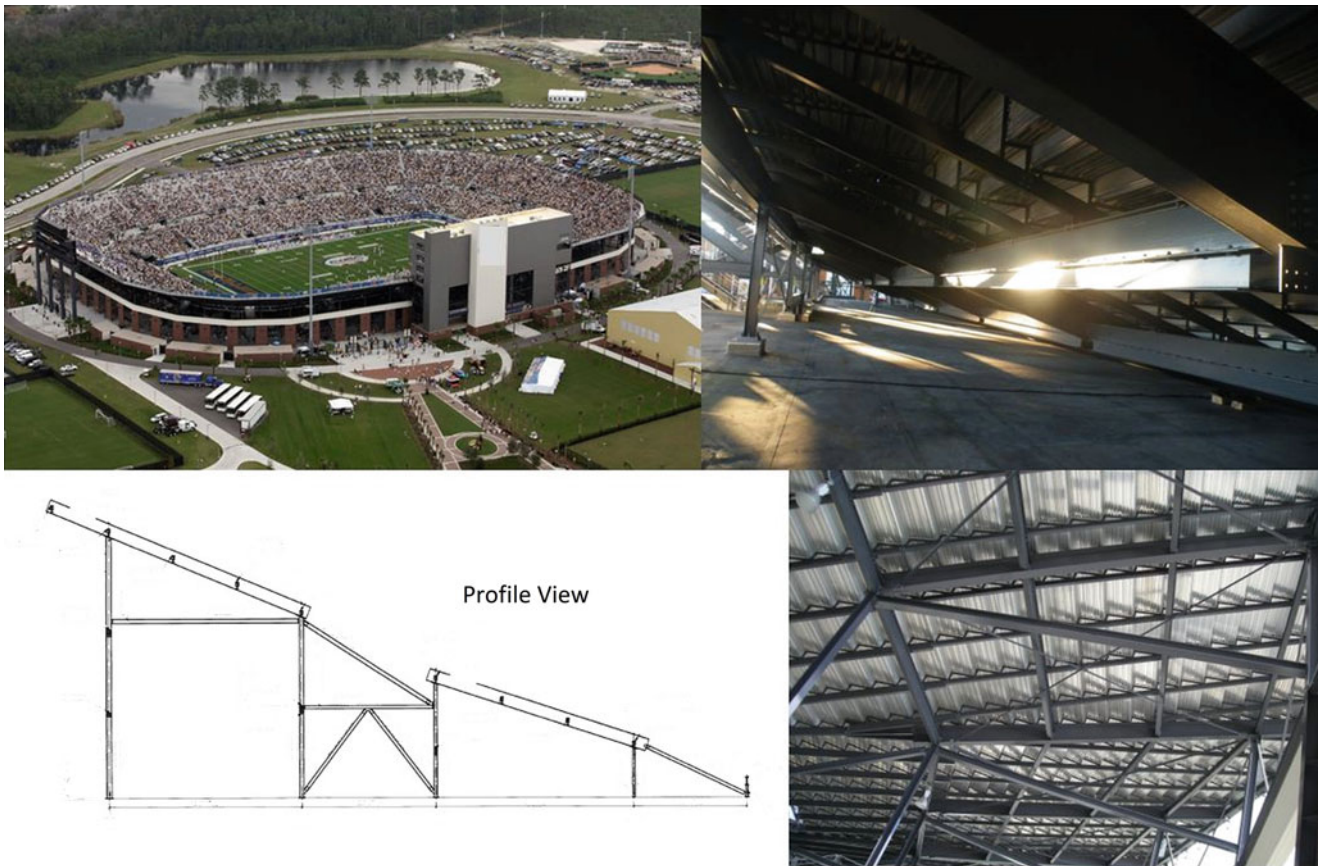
Architectural and structural details of a stadium as a demonstration of their slender nature
